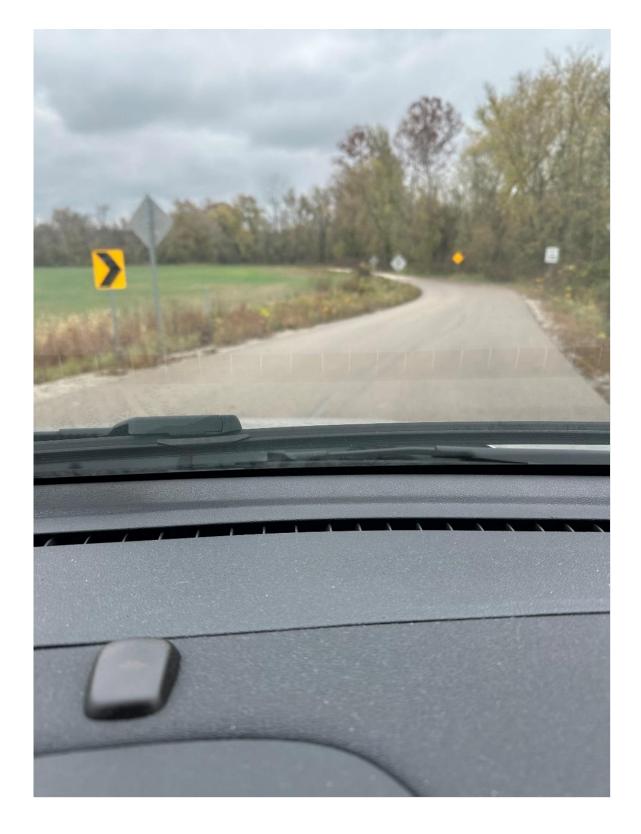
Traveling north along N Maple Grove Road from W Delap Road
